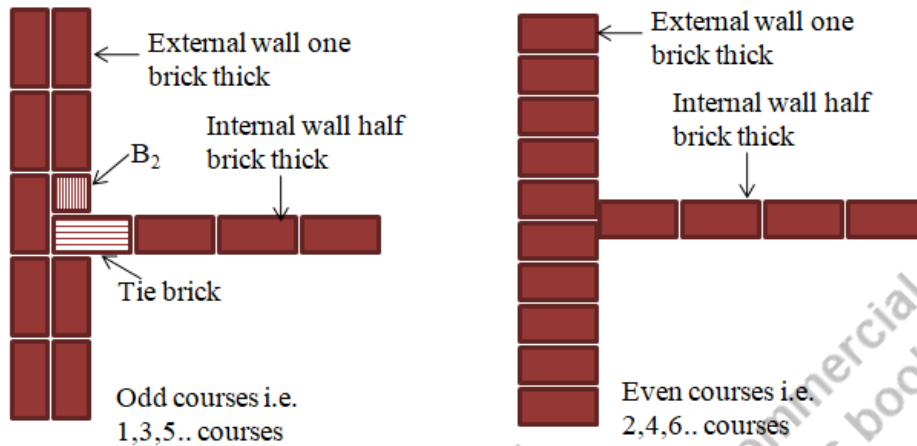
(a) Tee-junction between half brick thick wall and one brick thick wall
